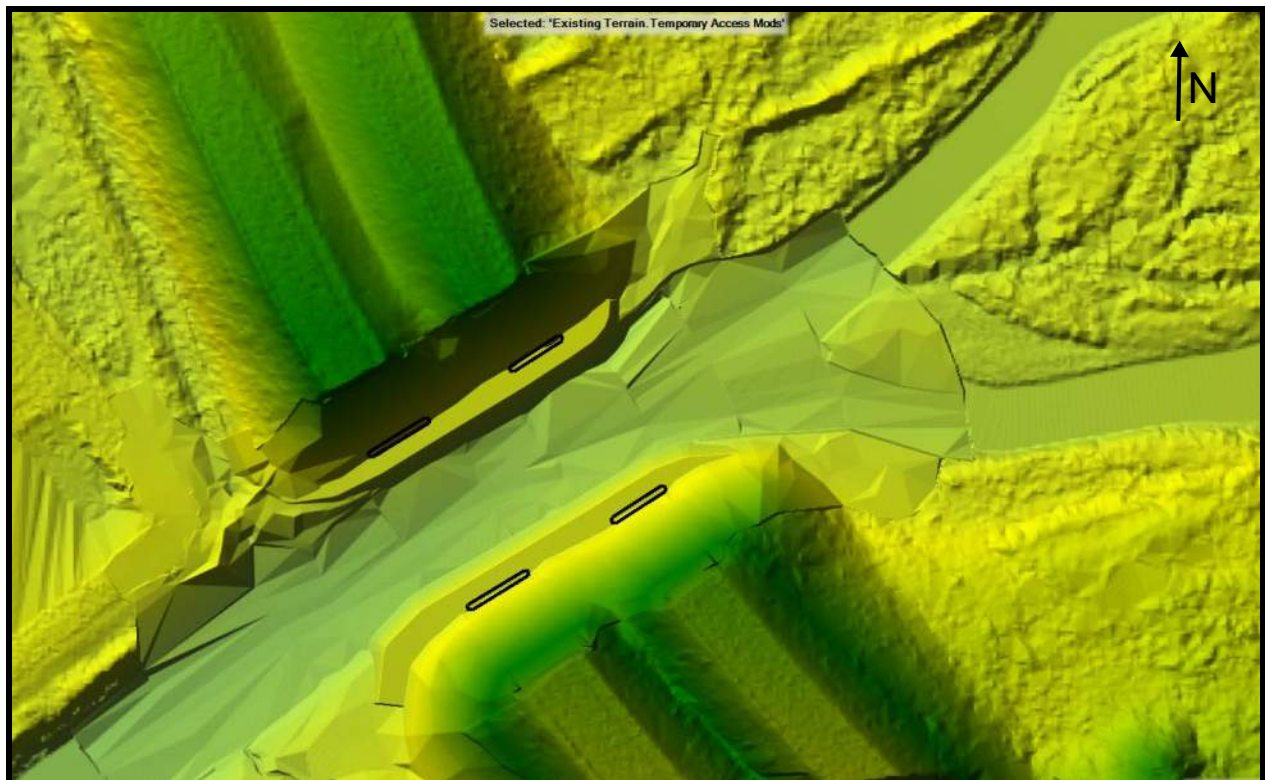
Plan of modified terrain with conceptual temporary access roads.
